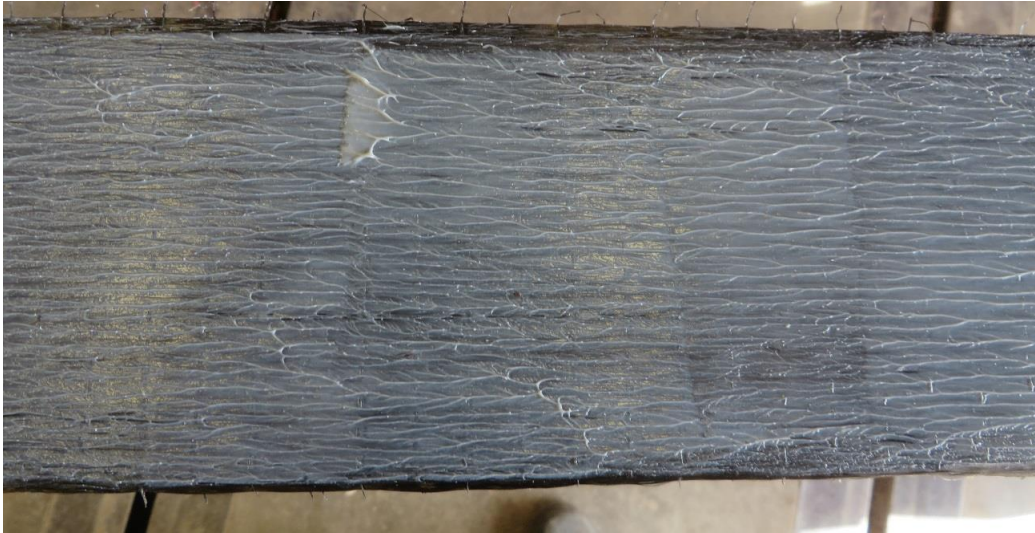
Epoxy adhesive penetrating the CFRP sheet
